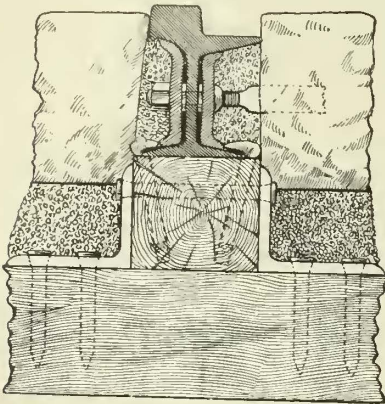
GIRDER RAIL WITH STRINGER SUPPORT.
